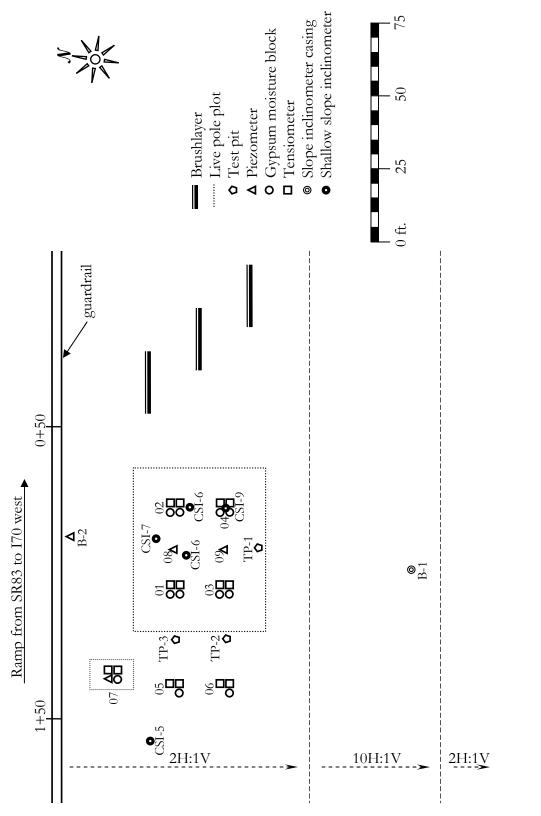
Muskingum County site plan and instrumentation layout. (see Figure 5.7 for STA reference)
